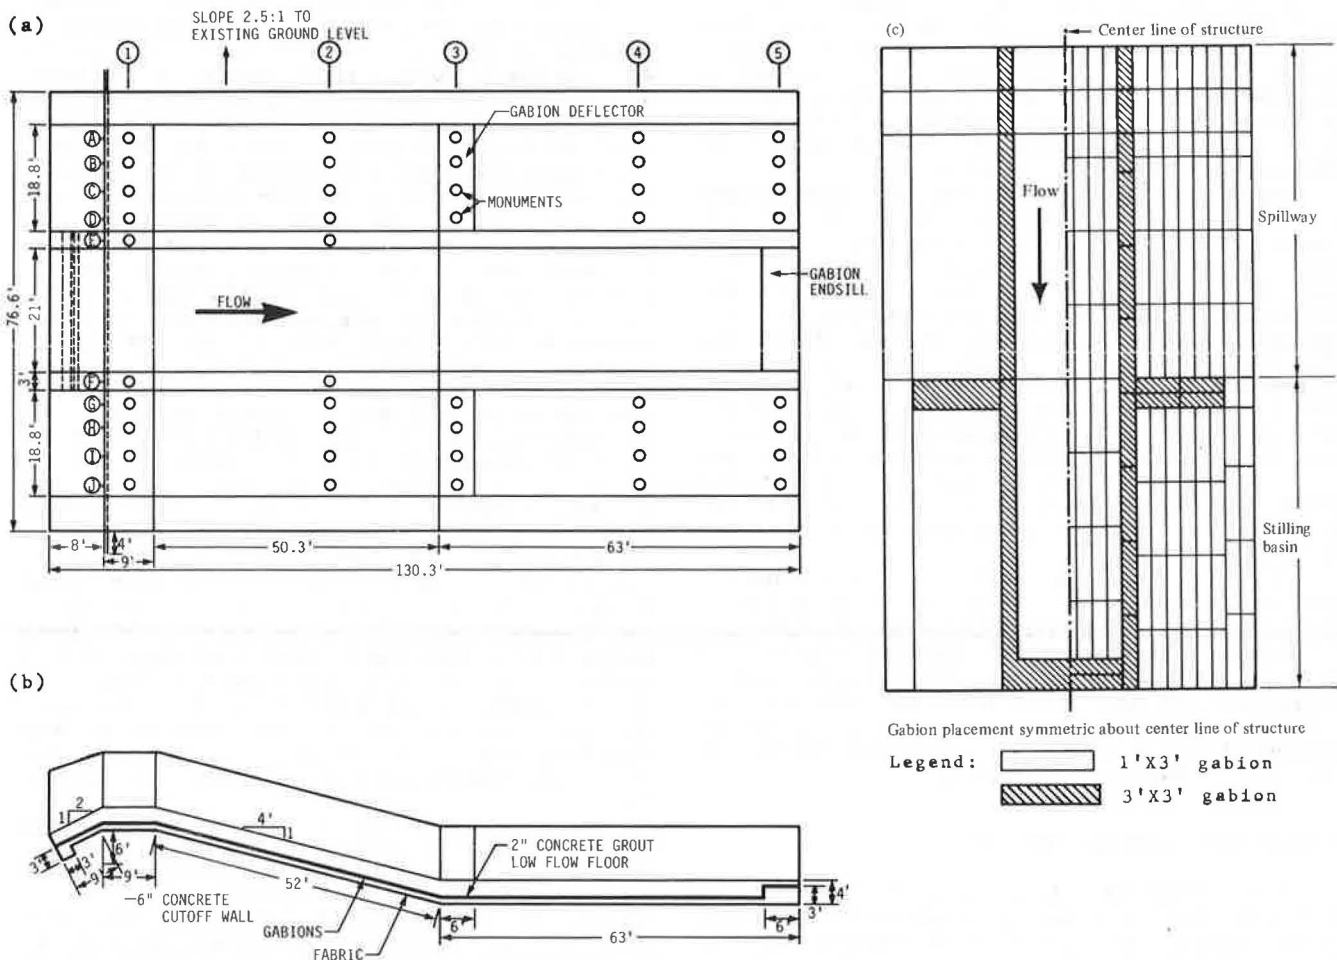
Gabion drop structure: (a) plan view showing dimensions and monument location, (b) section showing dimensions, (c) plan view showing gabion arrangement.
